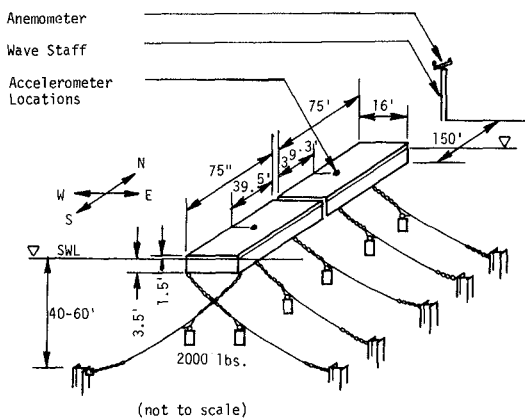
West Point Prototype Floating Breakwater: Project Site Instrument Layout
